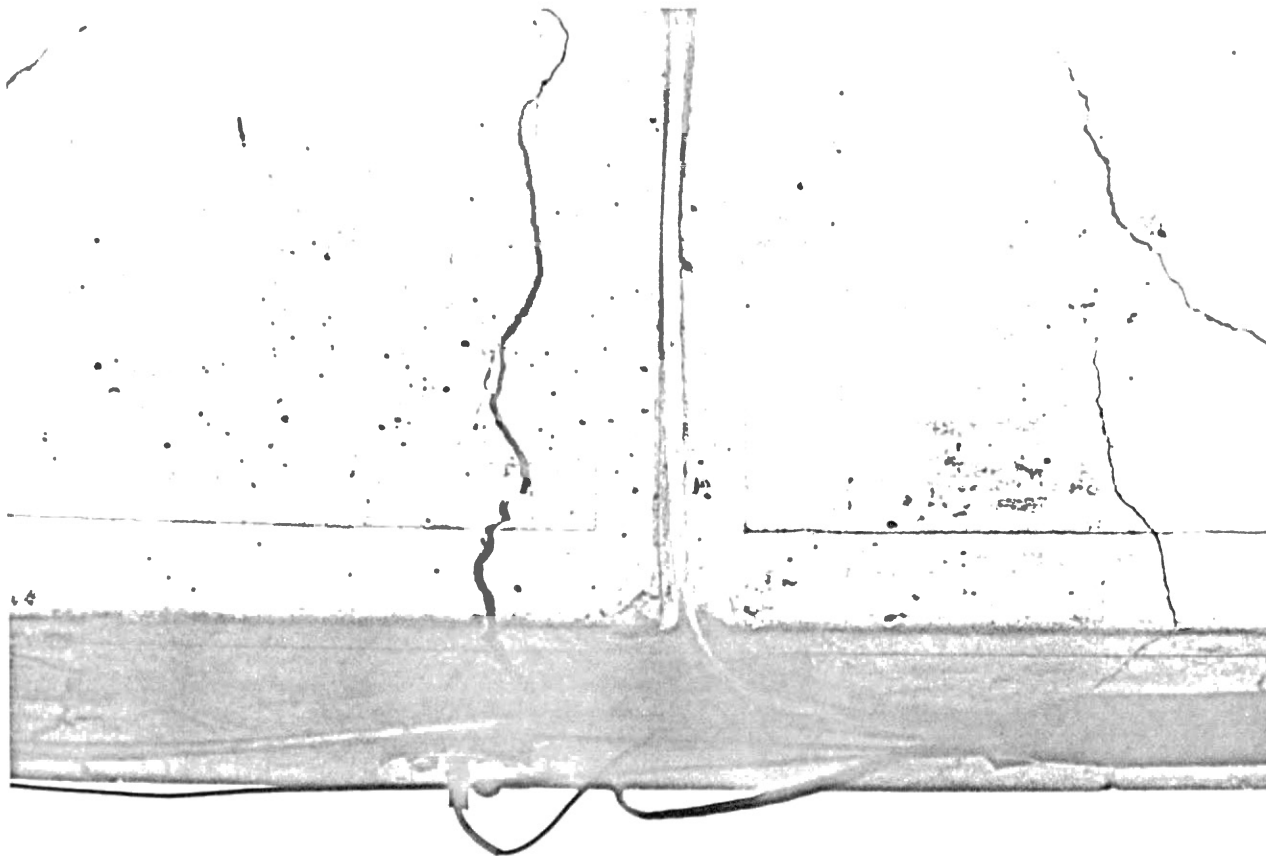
Side and Bottom of Beam No. 3 After Test 11, Showing Width of Crack
